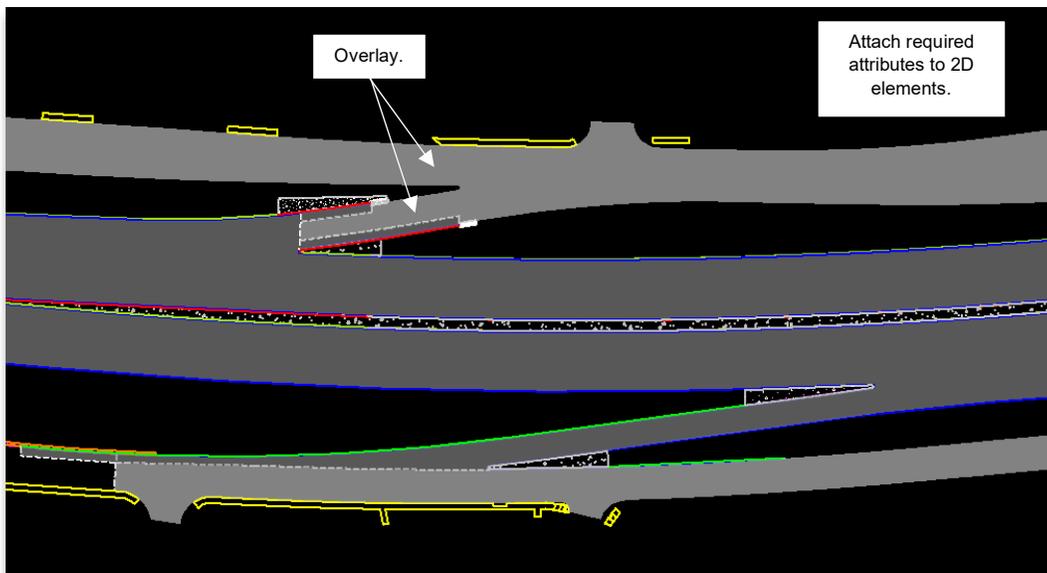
Modeling Criteria for Roadway Full Depth Pavement
